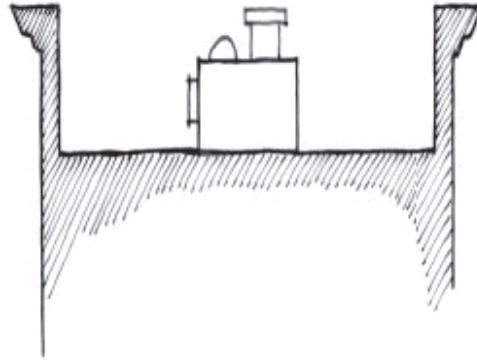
Parapet shall be tall enough to obscure mechanical equipment.
